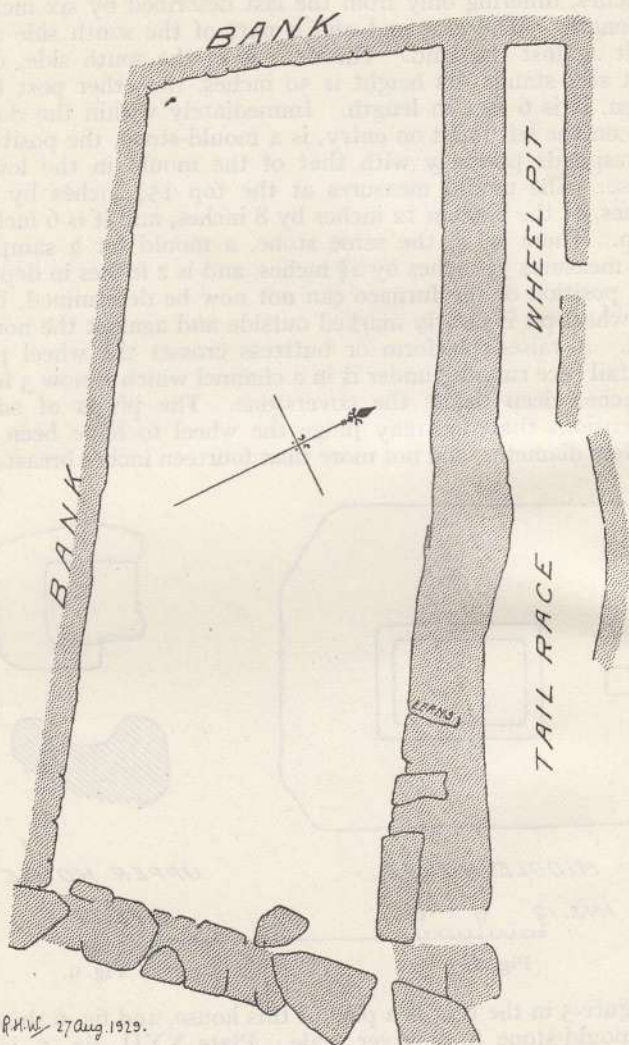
Upper Blowing-House, Walkham. General Plan.
